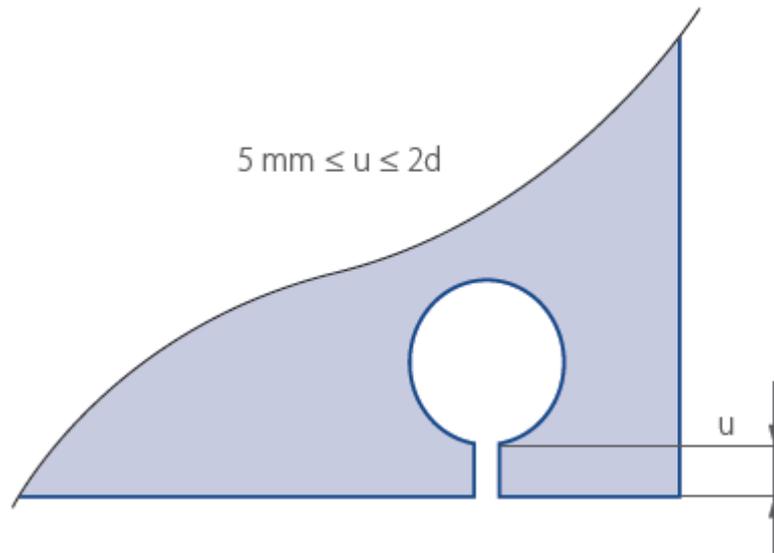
Example of a notch / cut-out for drill holes close to the glass edge
